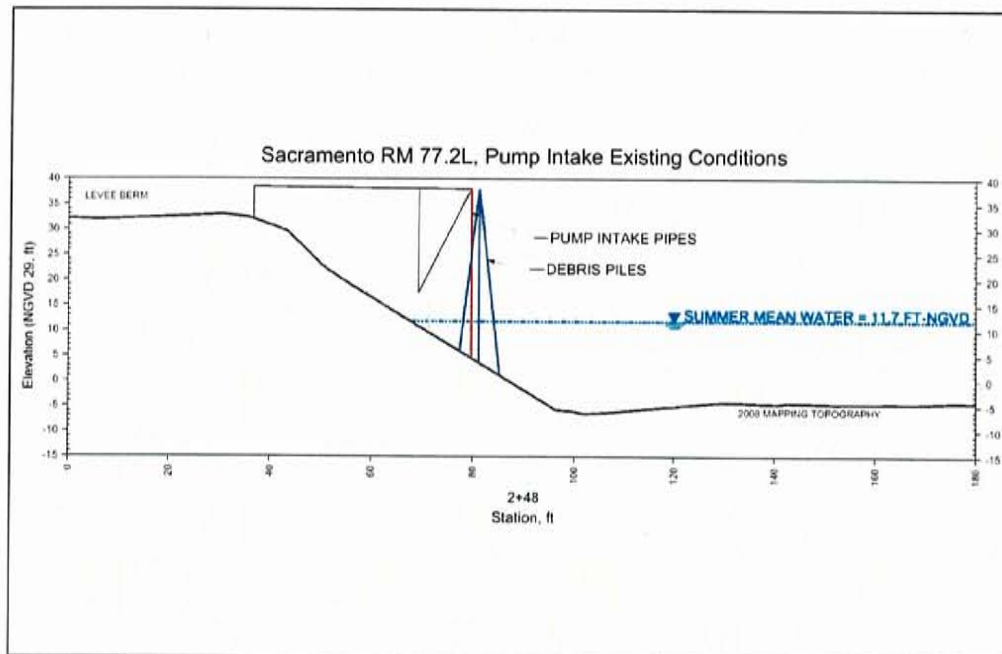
Existing conditions cross section at SAC RM 77.2L at the pump structure.
